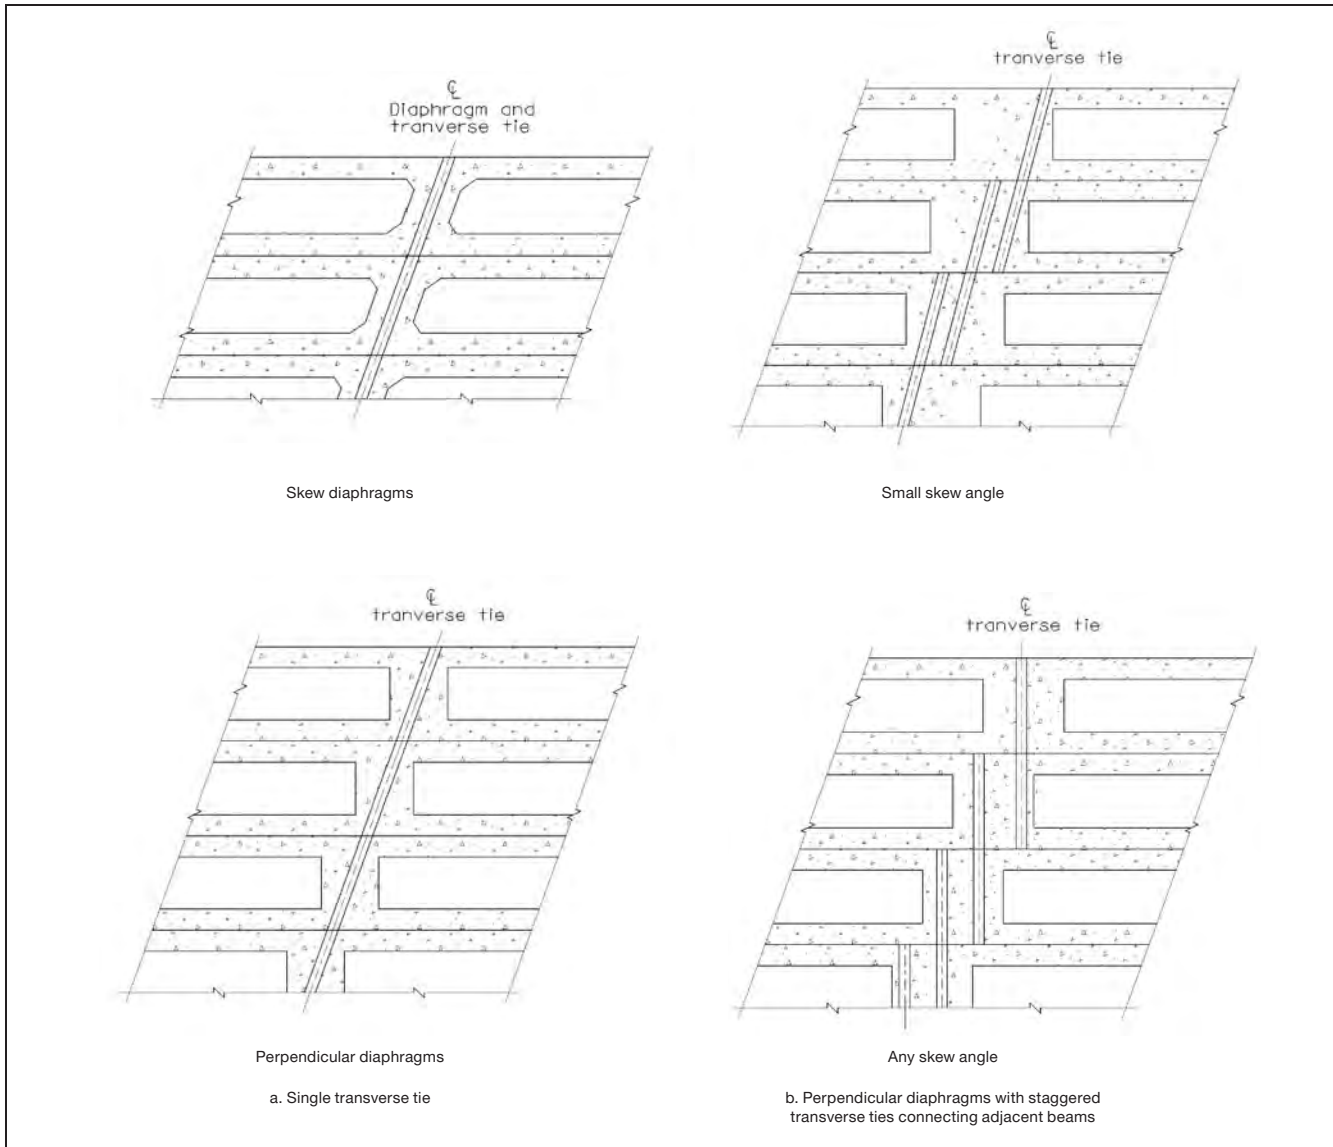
Transverse tie and diaphragm arrangements on skew bridges.
